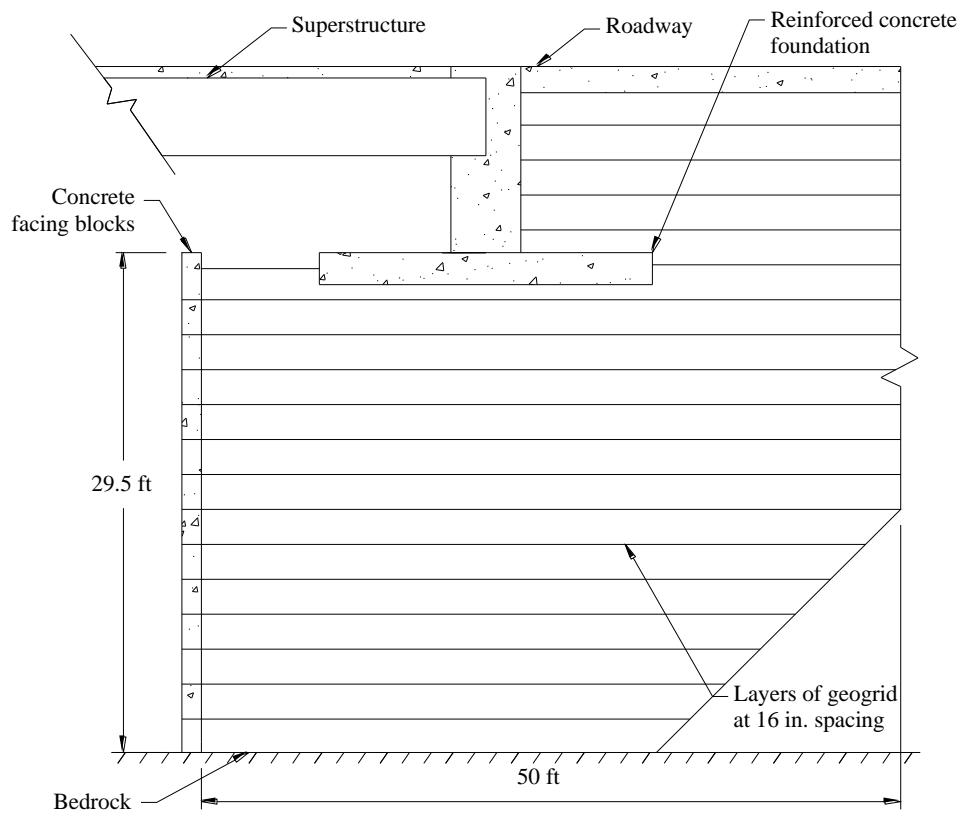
Cross-section of Founders/Meadows Bridge abutment (reproduced from Abu-Hejleh et al., 2001c)
